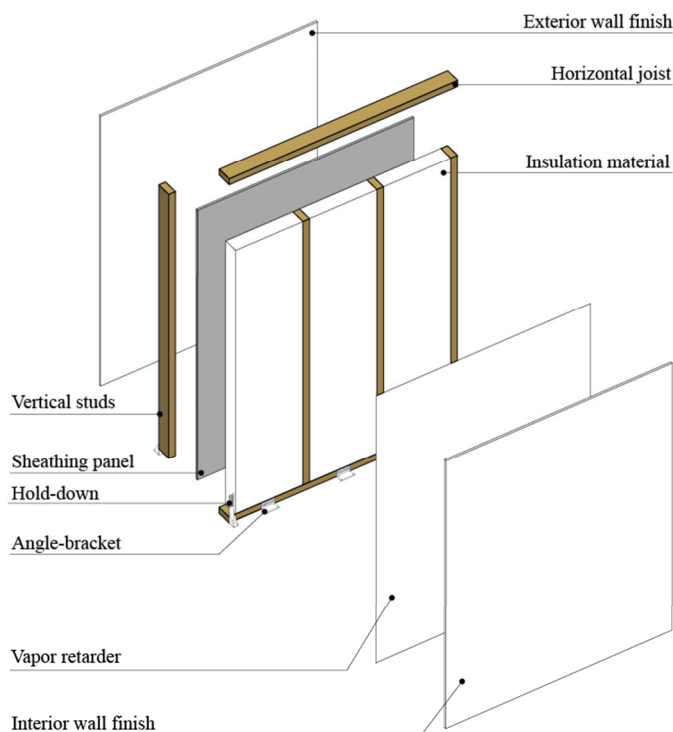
A typical configuration of a fully anchored timber shear wall braced on one side, with further layers to improve thermal performances and fire-vapor resistances.
